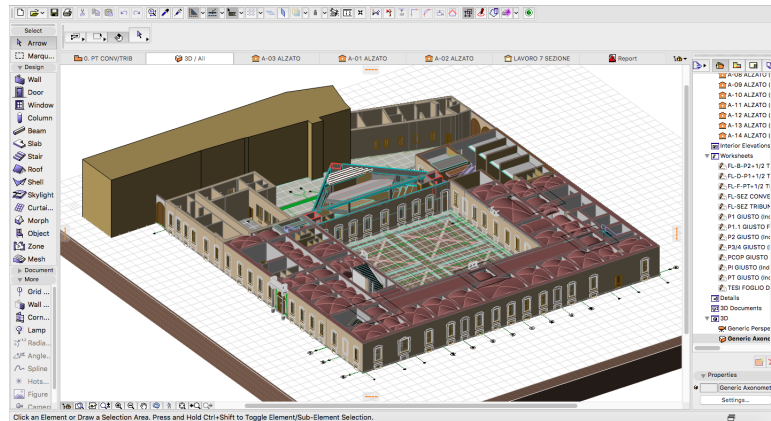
Section of the Palace of Justice in Pavia in an ArchiCAD project.
